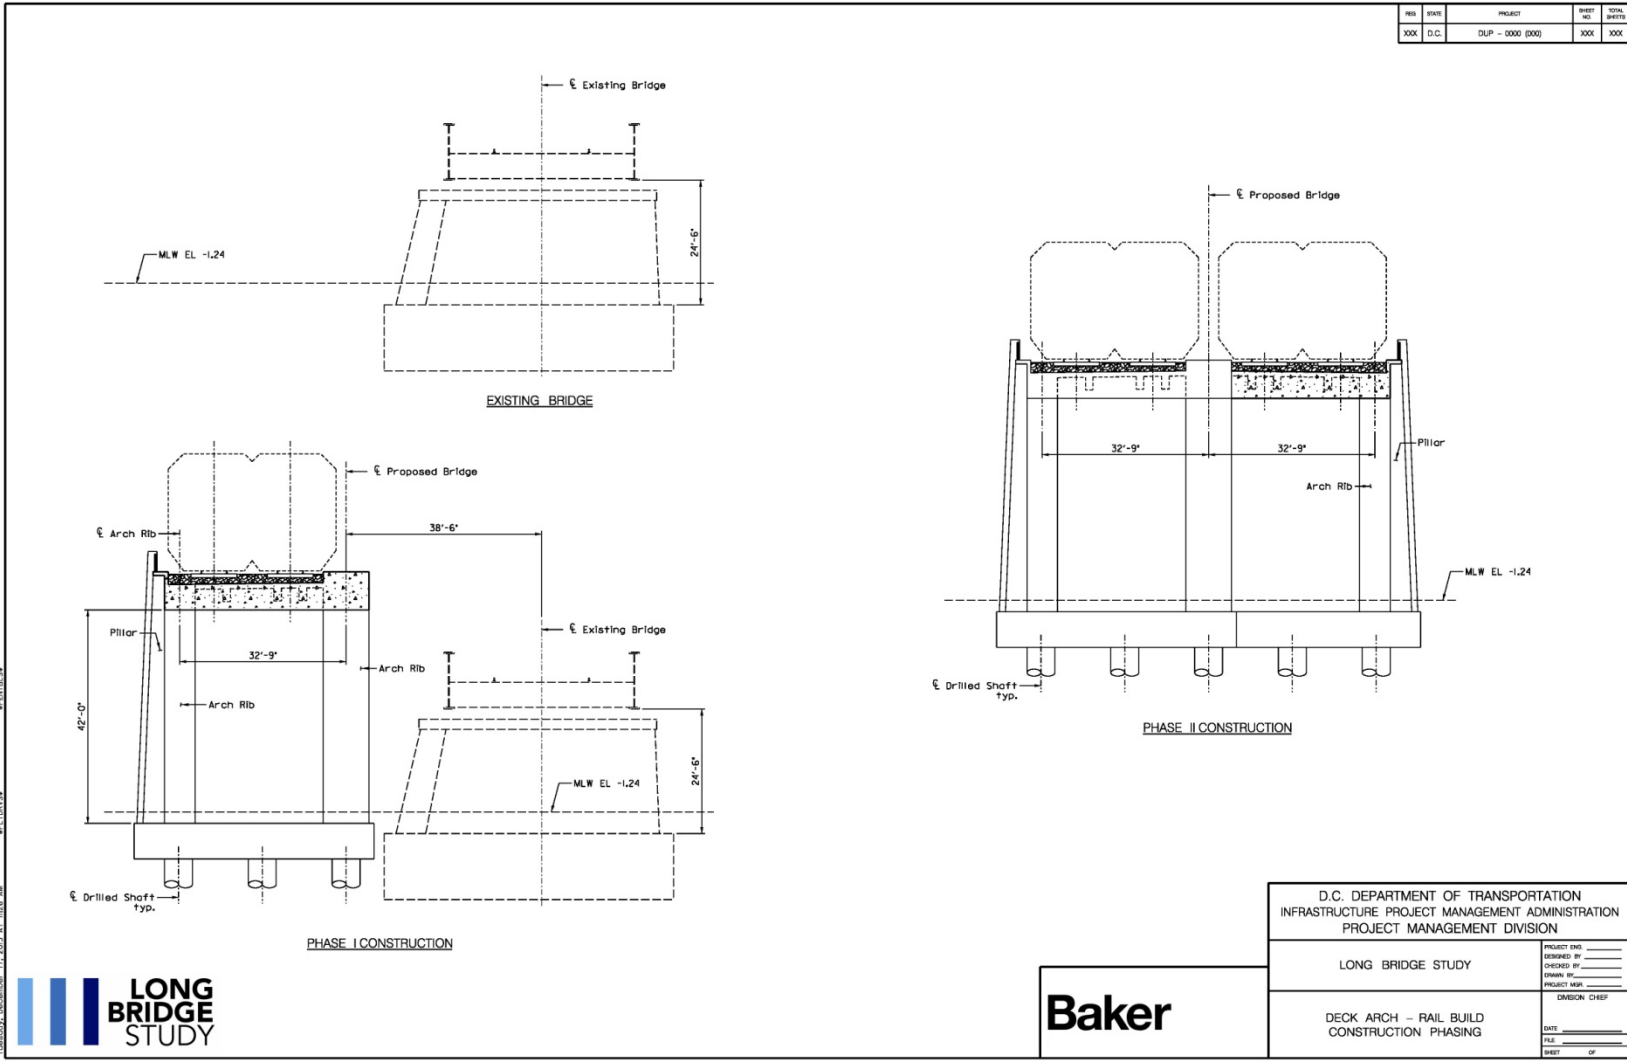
Concrete Deck Arch Construction Phasing - Rail
